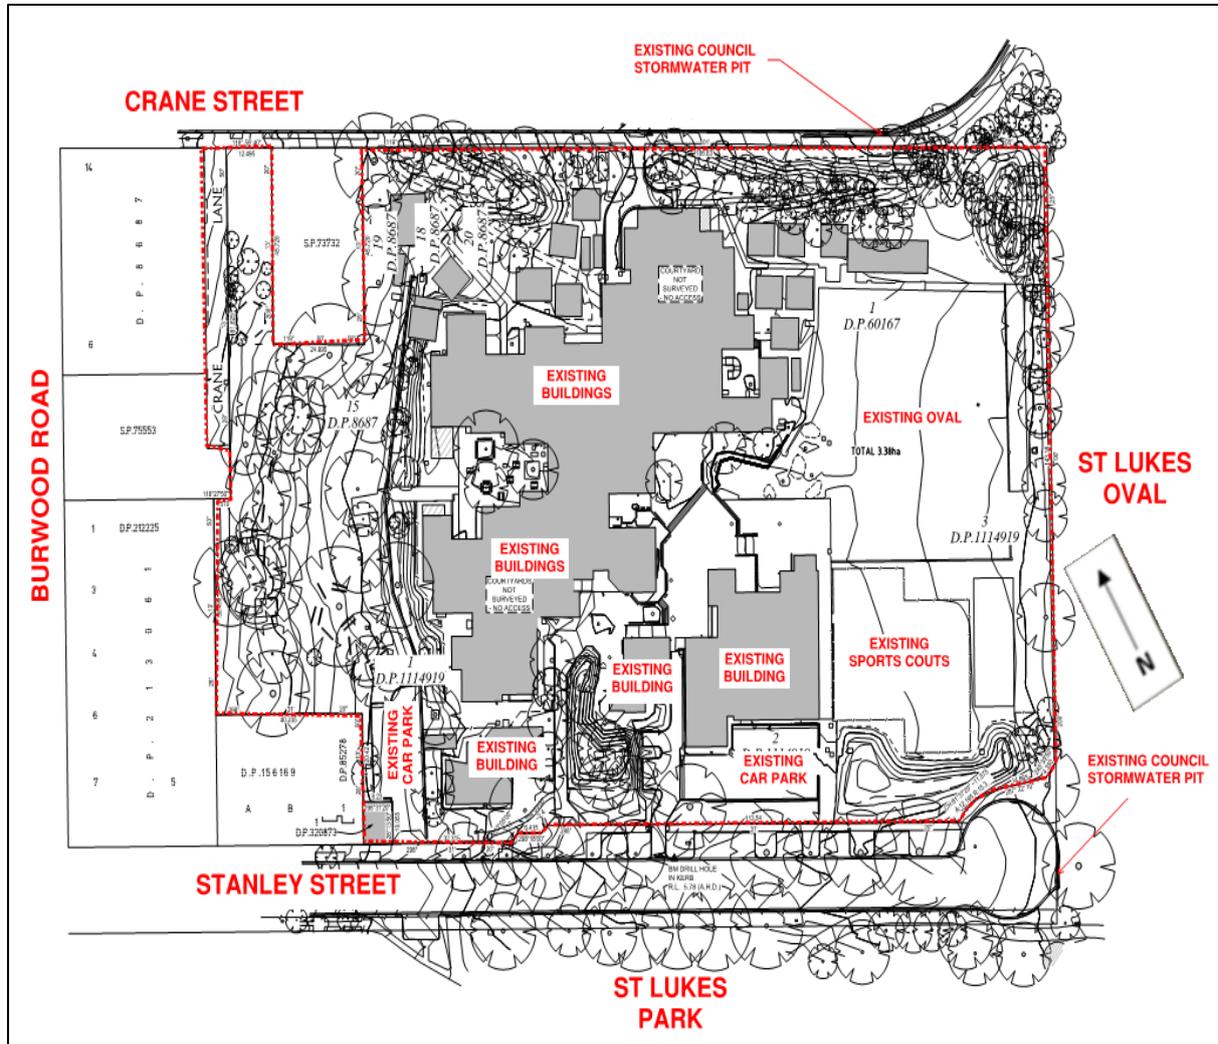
Existing Site Plan (Source Document: *Craig & Rhodes, Project – Detail Survey Over Concord High School, Dwg File Ref. 107-22G T01[00] – Detail Overall*)
